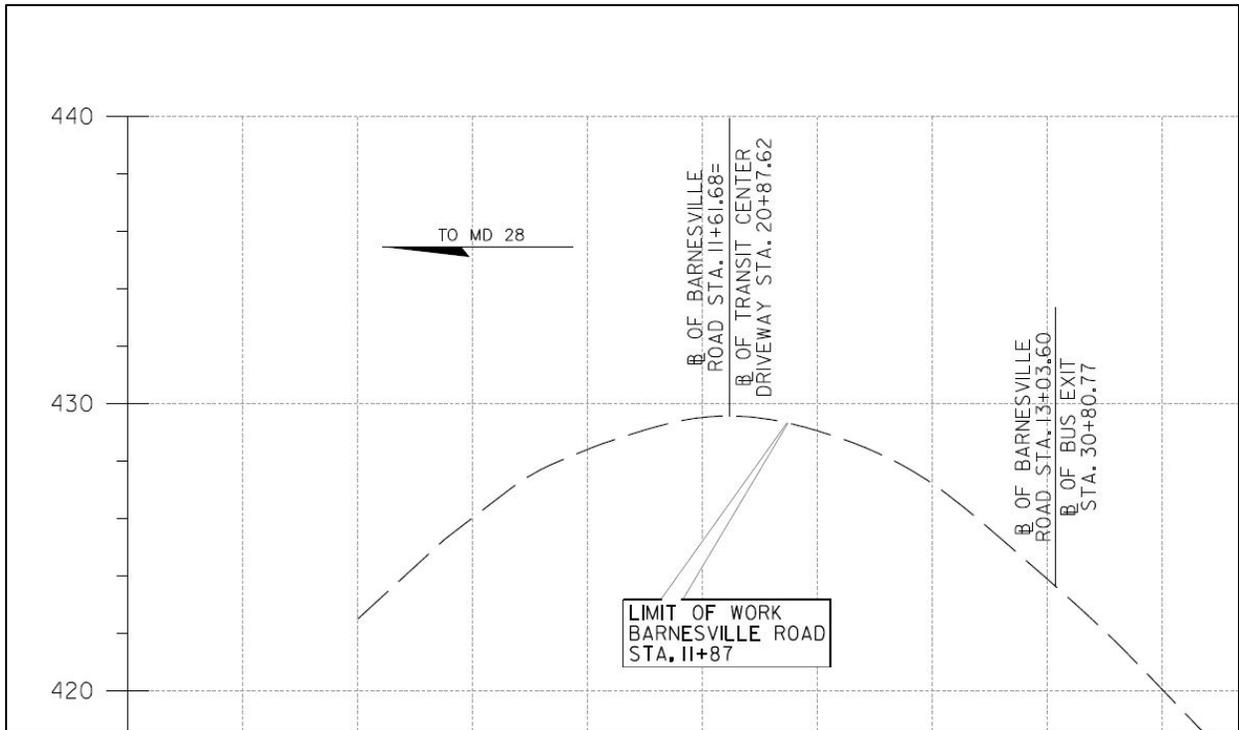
Profile – Barnesville Road (excerpt from plans) showing transit center driveway and bus egress locations
